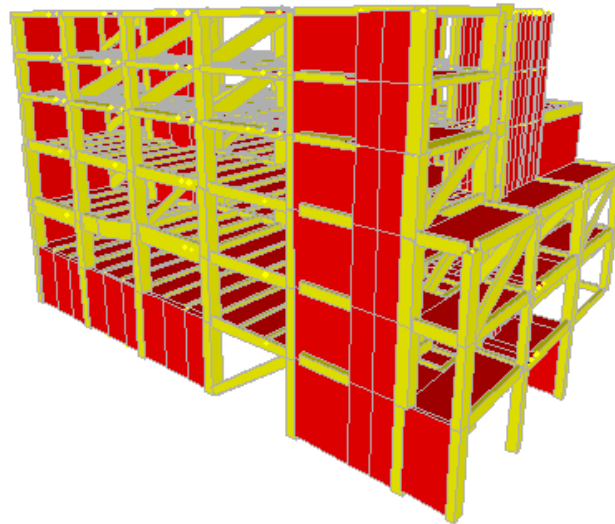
Finite Element Model of the Strengthened Building, with Brick Infill Walls.
